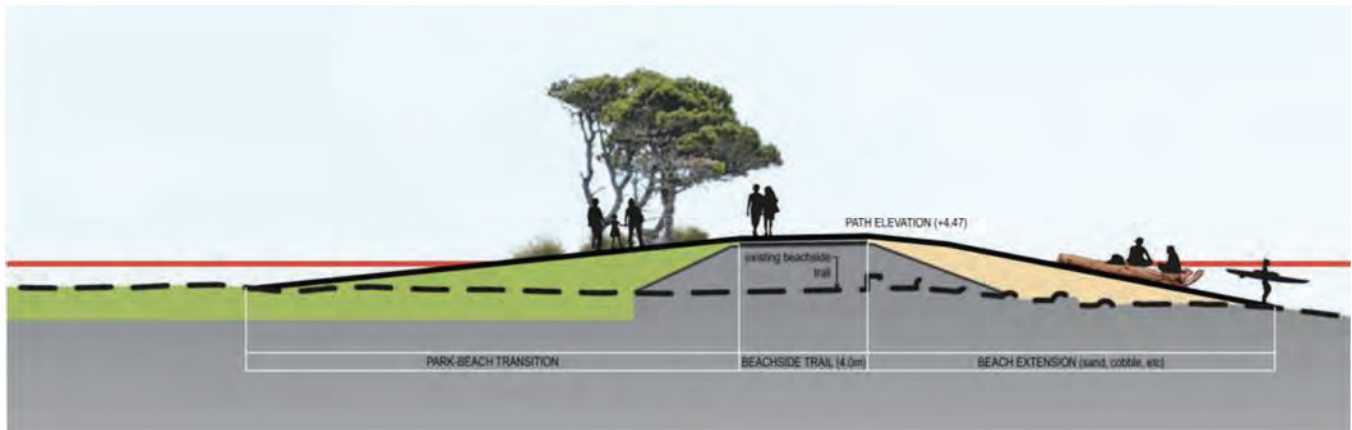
Proposed Cross Section – Ambleside Beaches
